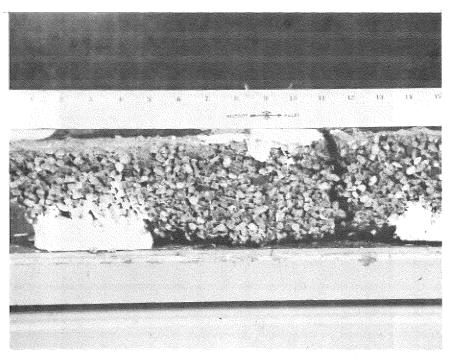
Pea-gravel drain Flexure Test Specimen B1 after testing. Failure occurred with a concentrated load of 270 pounds, indicating a modulus of rupture of 91 psi.
